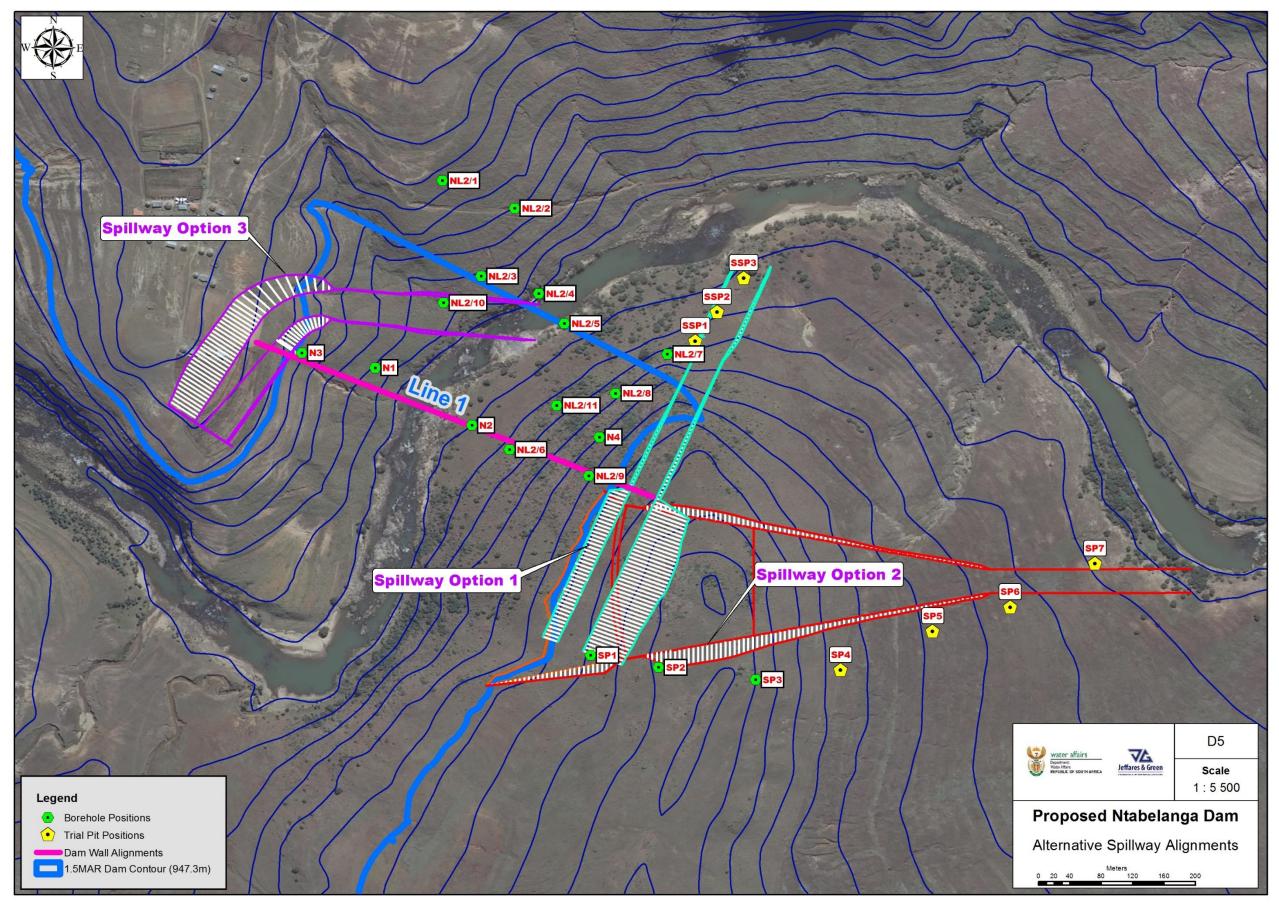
Ntabelanga Dam Alternative Spillway Alignments
